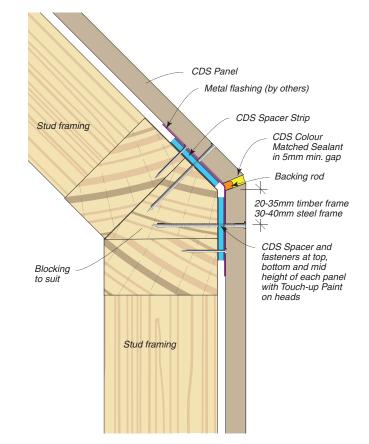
Obtuse Angle Corner with Metal Flashing and Colour Matched Sealant – Plan View
